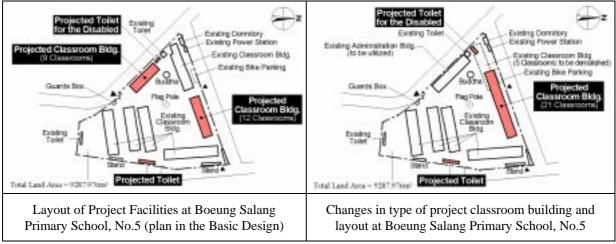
Changes in type of project classroom building and layout at Boeung Salang Primary School, No.5
